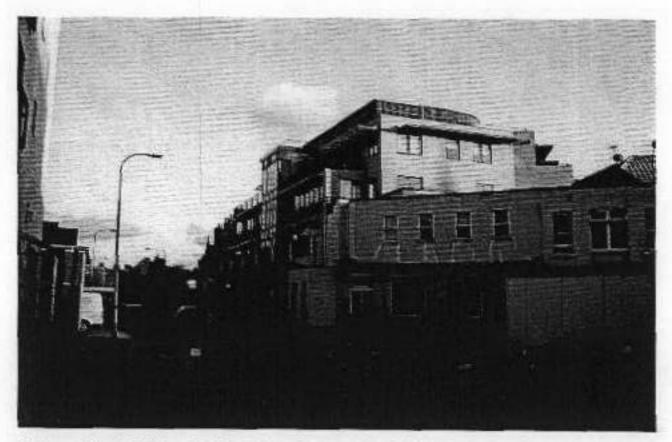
View of 55 Holmes Road from Holmes Road showing the existing plant room on the roof.
